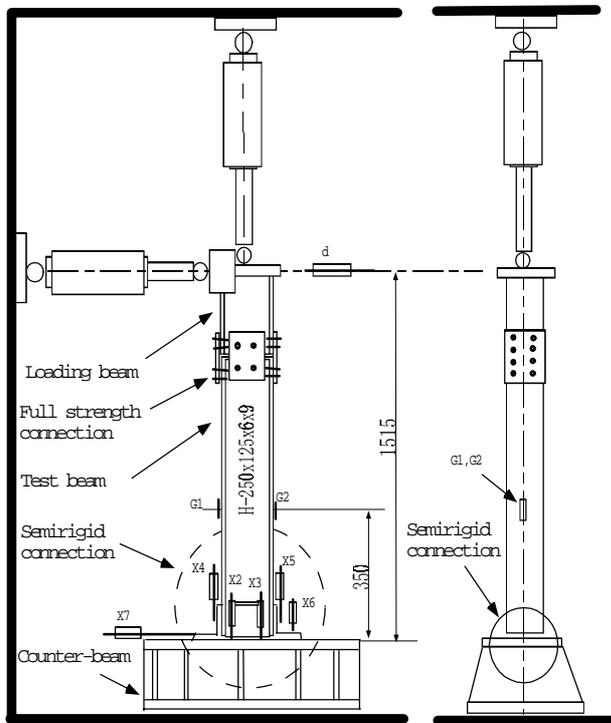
Test Setup on H-shaped Beam with Split-Tee Connection
